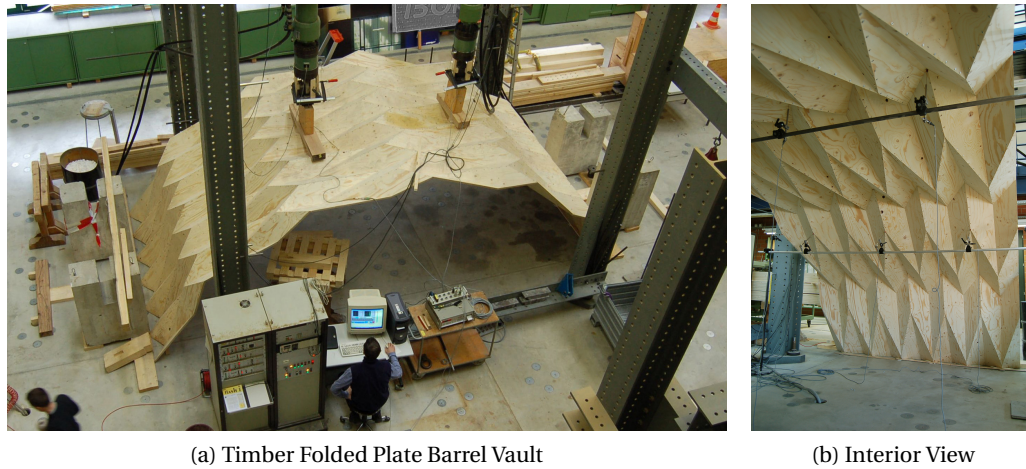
Timber Folded Plate Barrel Vault - built from Plywood Panels at the laboratory for timber construction. [BW06]
